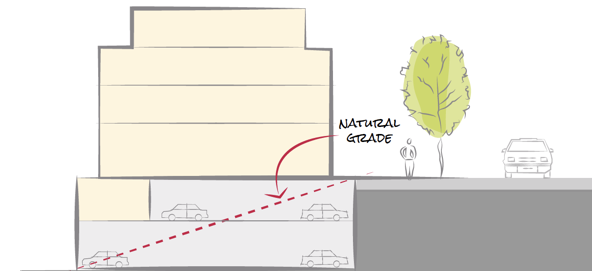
Use natural slope for under-building parking wherever possible (3.1.a).
